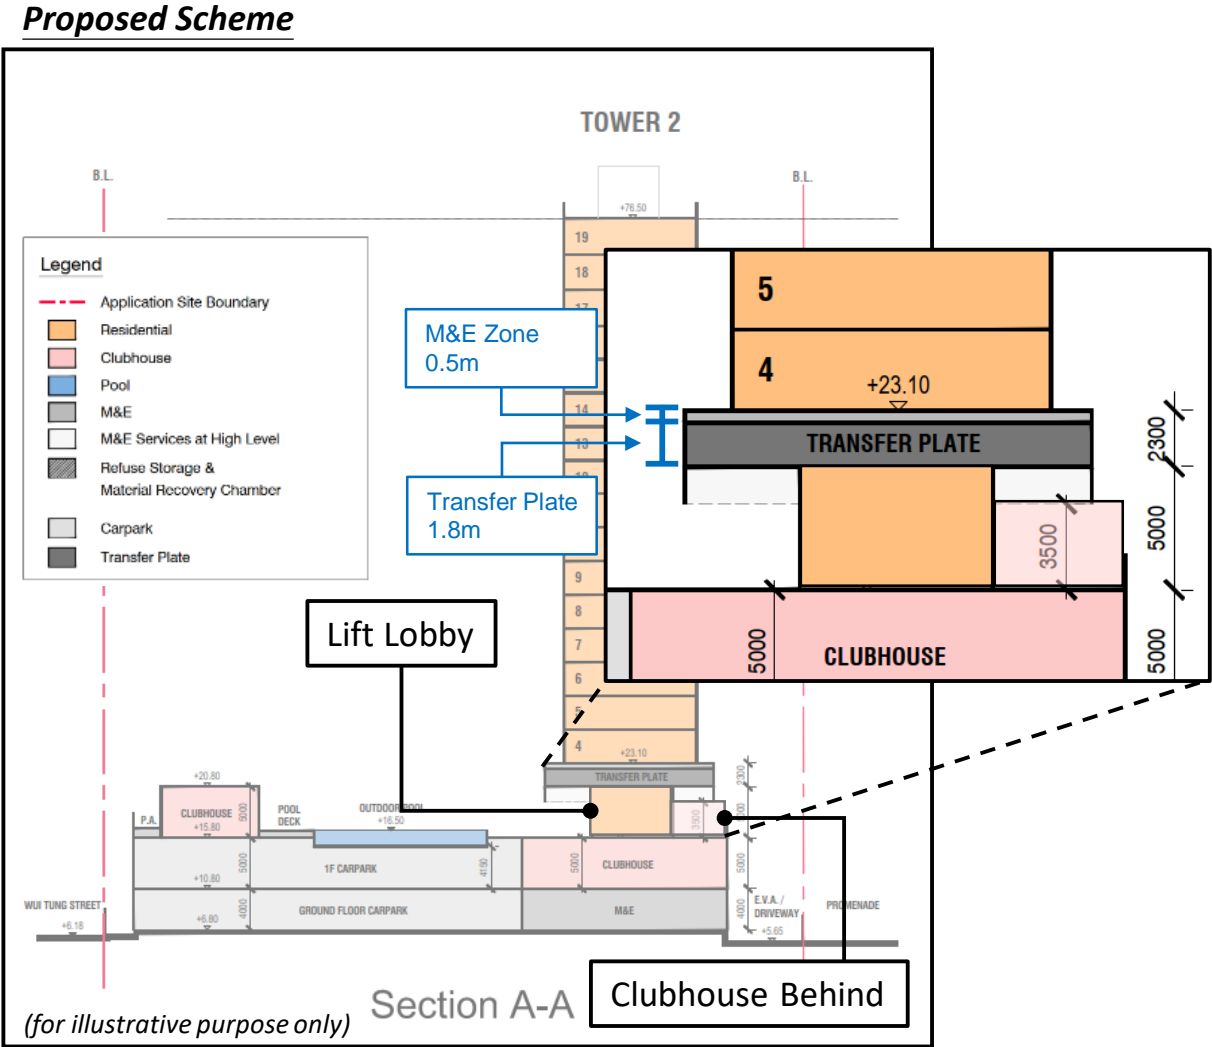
Proposed Residential Floor to Floor Height Being Reasonable
